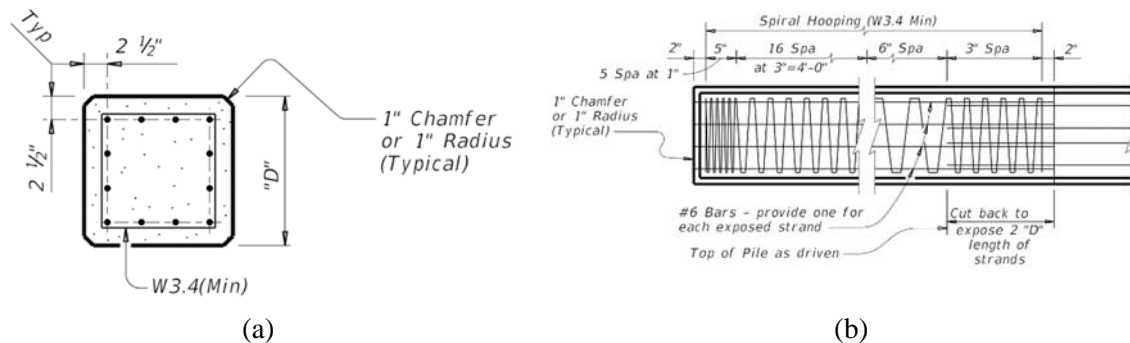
TxDOT Specification for Prestressed Concrete Piles, (a) Typical Section Thru Piles, and (b) Pile Build Up Detail
